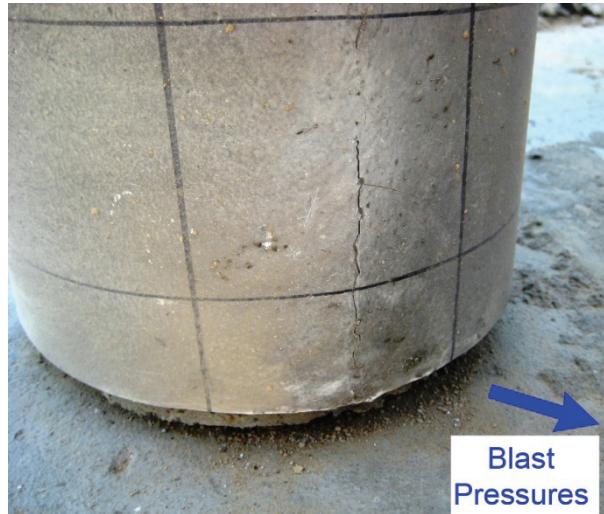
Left Side View of Column SJ1 (Test 4)
